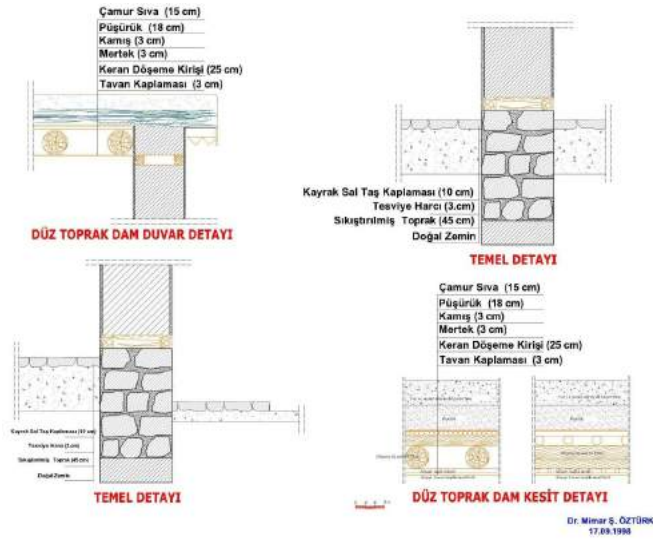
Polat Yörükoğlu House Main-Wall and Covering Details, drawn by author.
